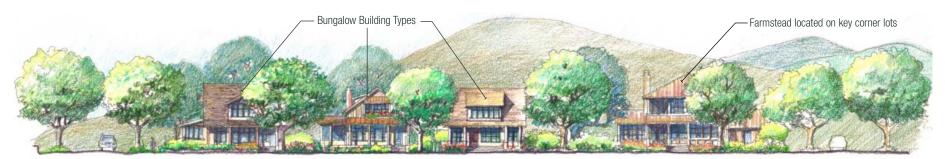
Conceptual Street Elevation - Bungalow and Farmstead Building Types
